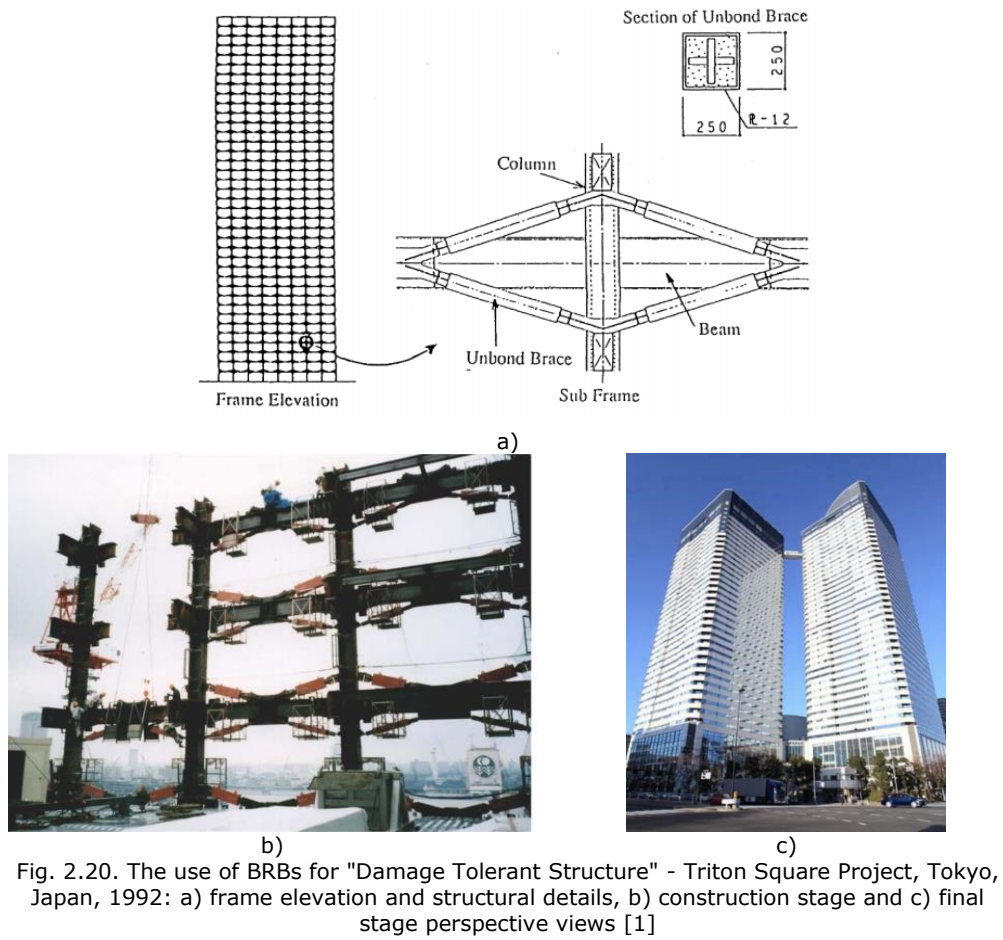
The use of BRBs for "Damage Tolerant Structure" - Triton Square Project, Tokyo, Japan, 1992: a) frame elevation and structural details, b) construction stage and c) final stage perspective views [1]
